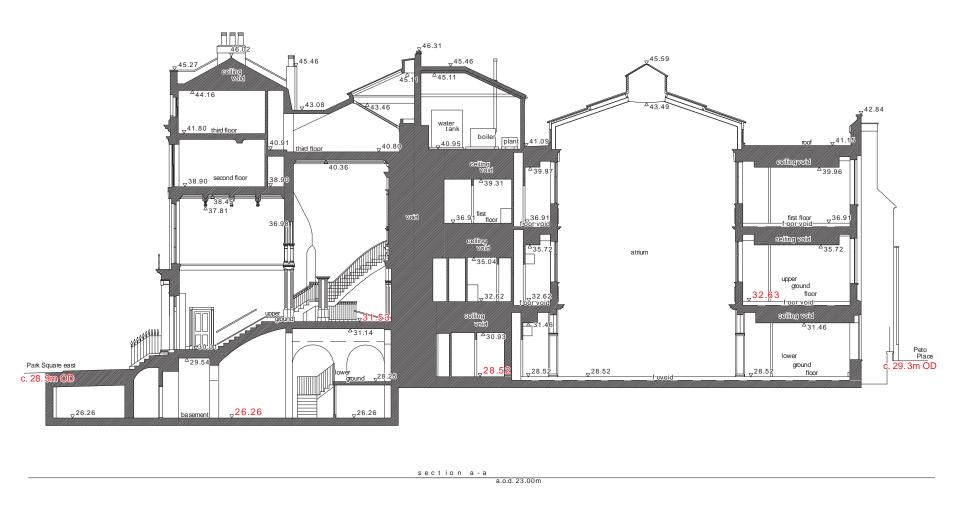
Existing south facing section (Hub Architects and Designers Ltd, section A-A, Dwg No: 1126-EX-12, June 2012
